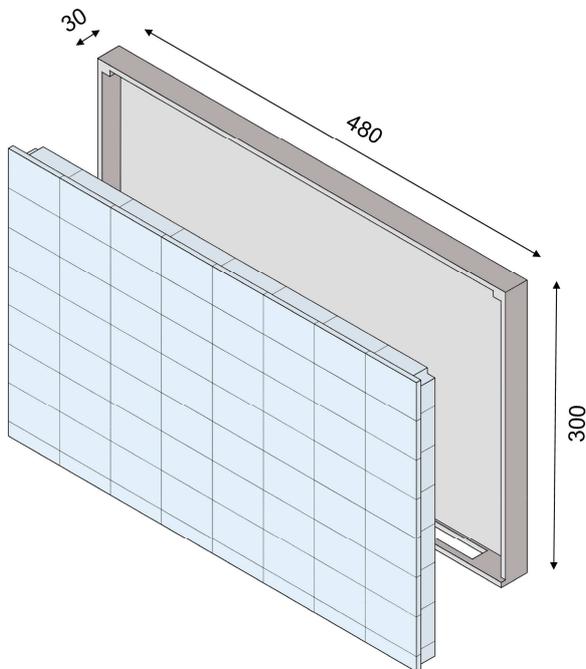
Non-load bearing façade element for refurbishment (size in cm).
